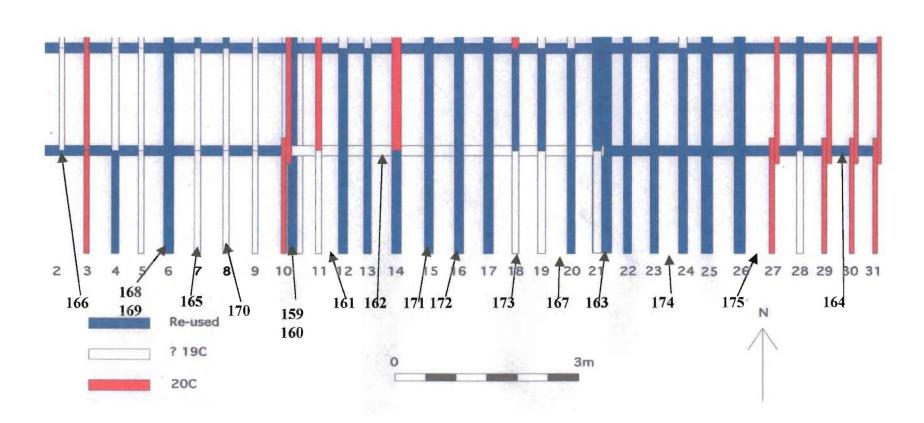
Long-section of the Lady Chapel south aisle roof to show possible phasing of timbers and position of timbers sampled (viewed from the south looking north)
